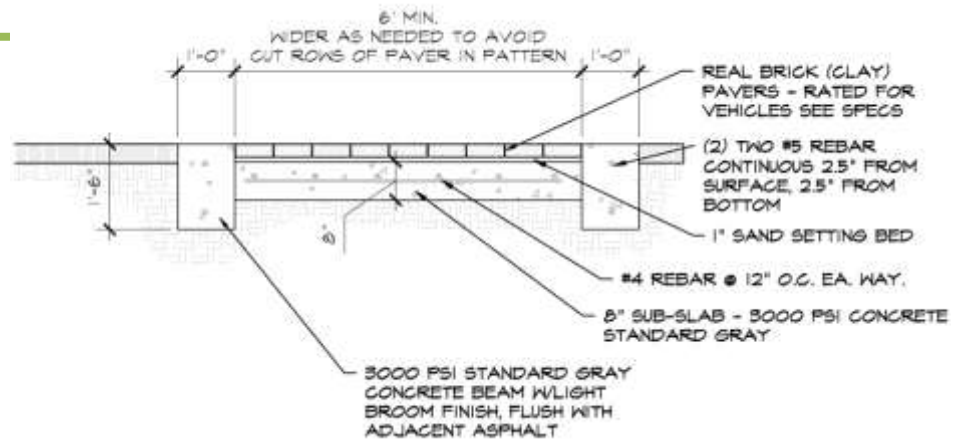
Standard Section @ Crosswalks – Required (Raised Optional)
